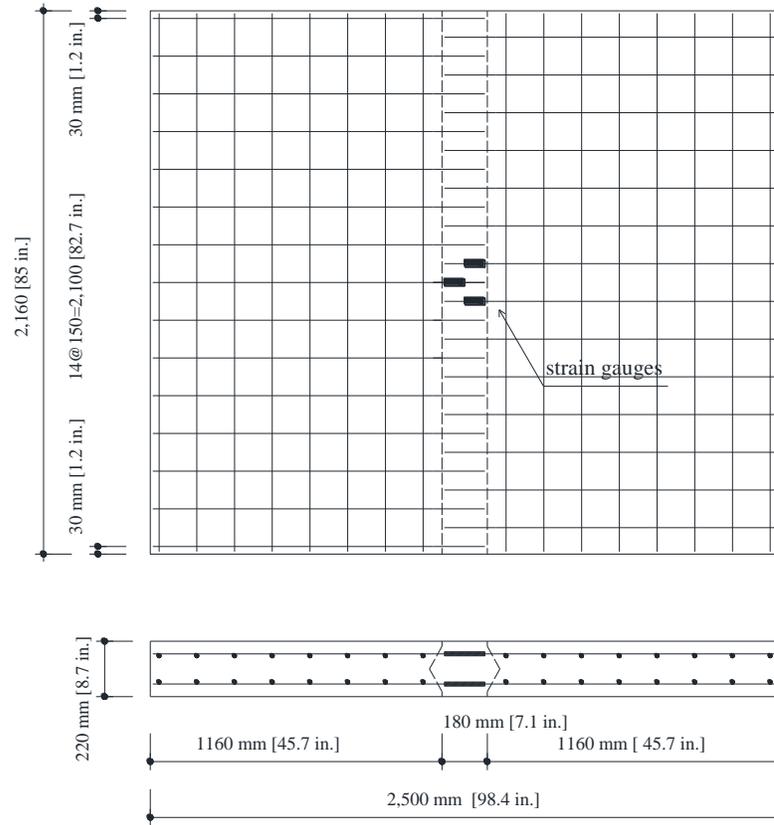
Geometry of the precast deck specimens (Note: 1 in. = 25.4 mm)
